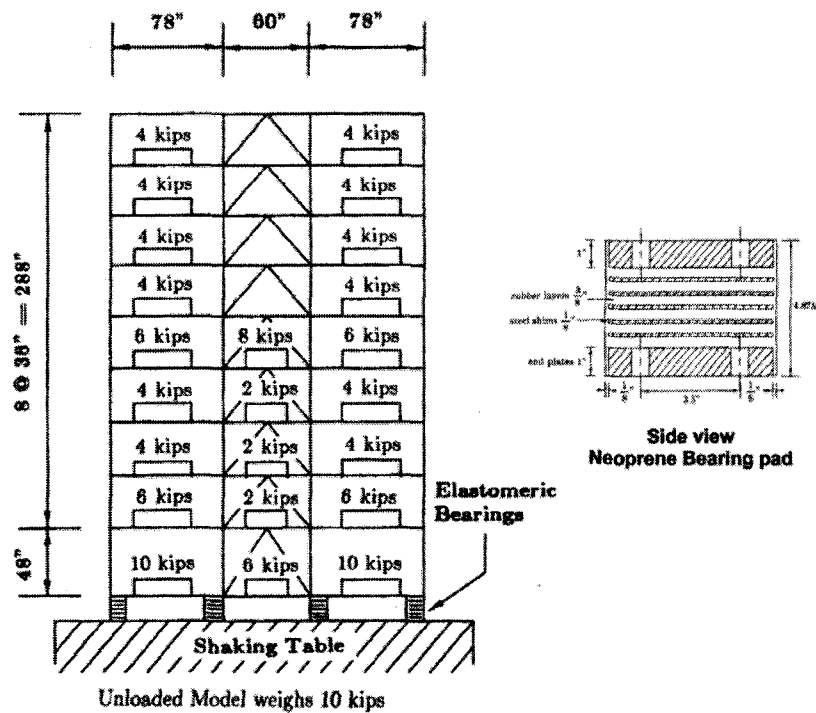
Test setup for the steel frame with elastomeric bearings
